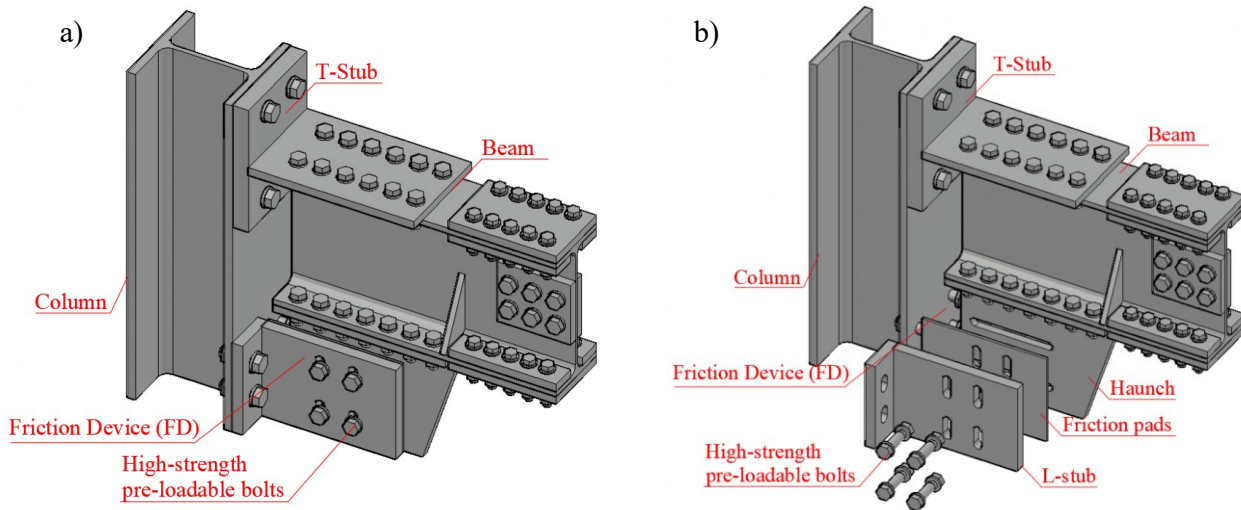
FREEDAM BCJ: Geometrical configuration. a) 3D view, b) exploded view
